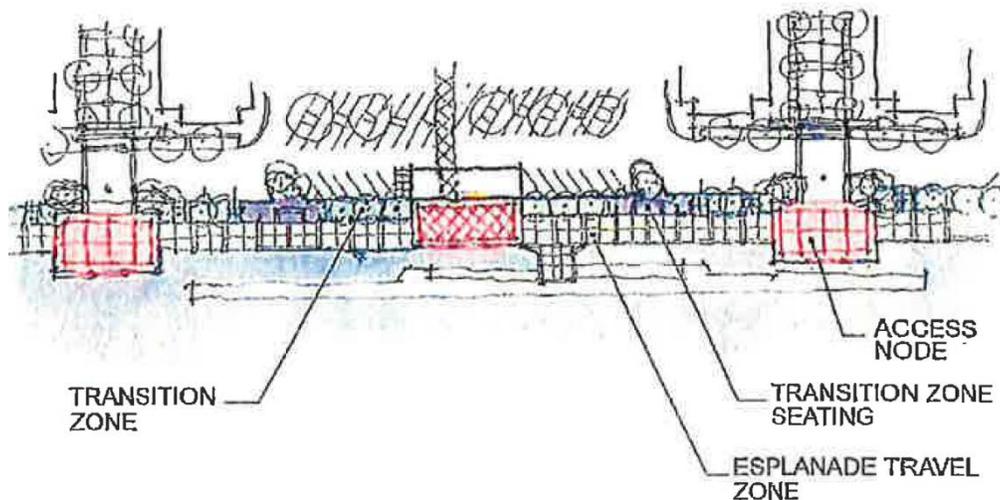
Sketch from Port Gardner Wharf Showing How Site Transitions Between Parking and the Esplanade
